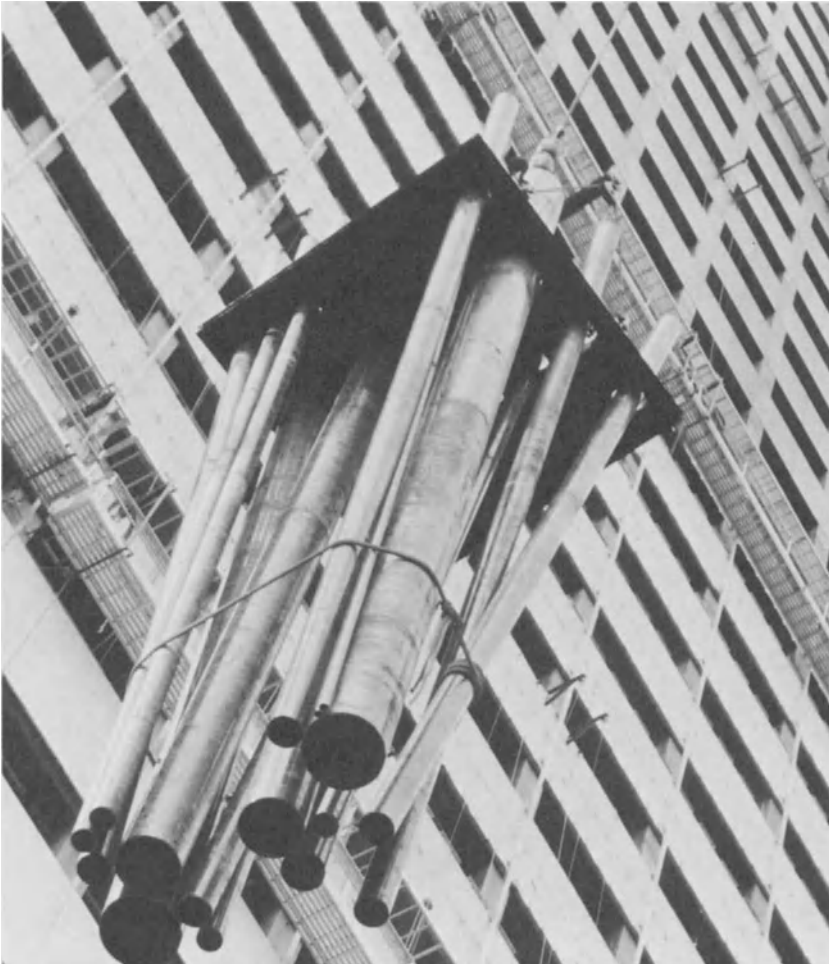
Pipe assembly being hoisted atop First Canadian Place during construction
